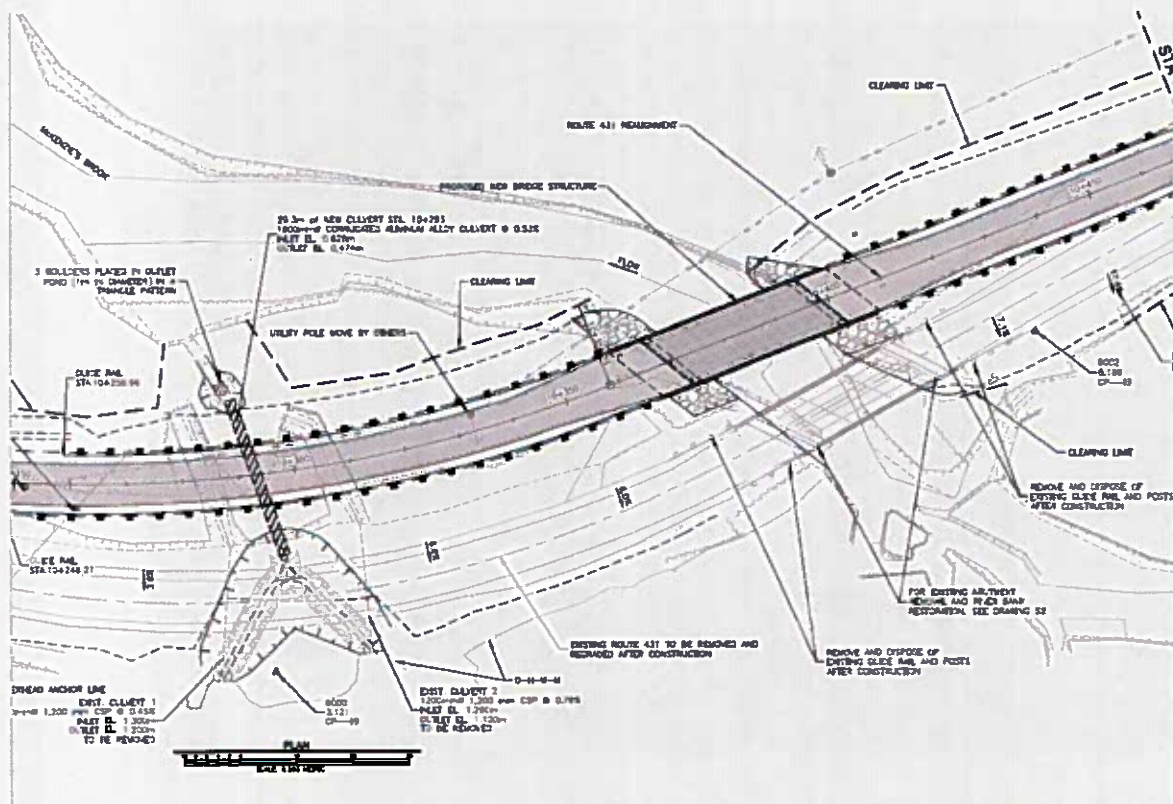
Engineer drawing of proposed bridge structure and highway realignment, including culvert installation and the existing roadway to be decommissioned after the new highway is in service (WSP 2019).
